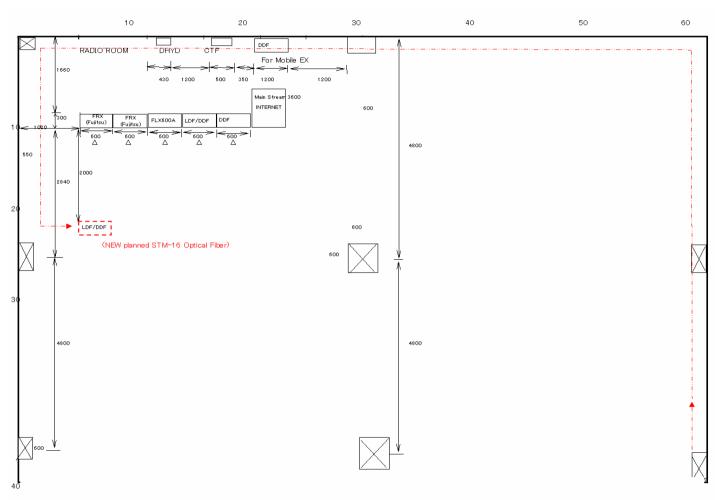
RADIO/MUX ROOM (2F) Planned Installation Place (NEFAS SILK)
